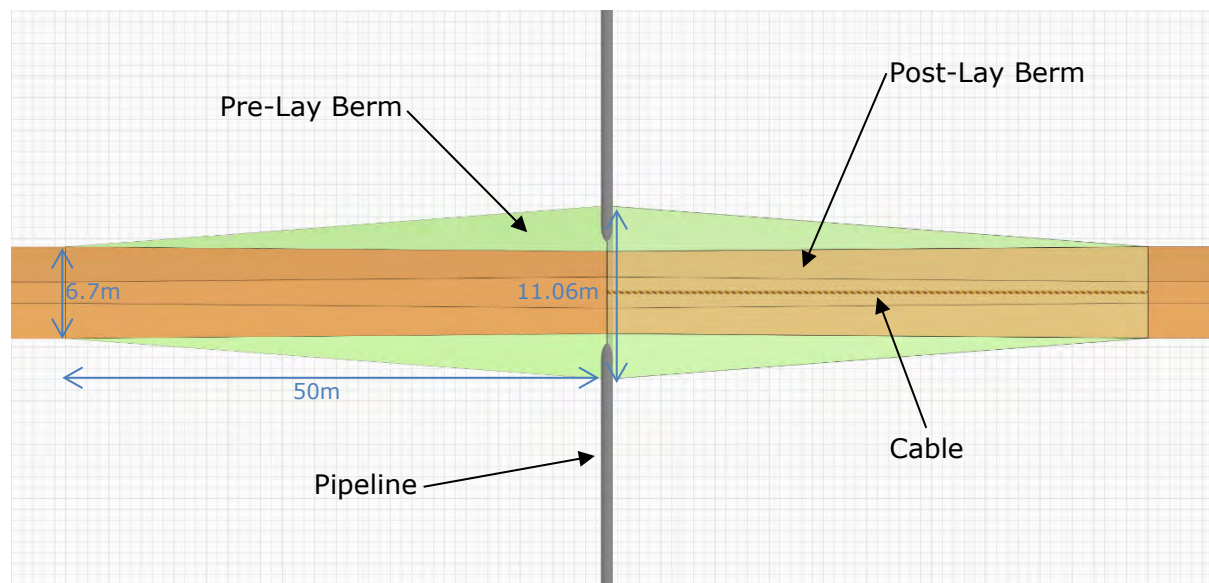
Plan view of pipeline crossing berm design with pre-lay berm (green) and post-lay berm (orange)
